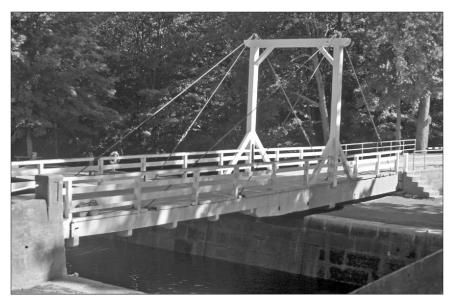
Jones' Falls Swing Bridge, a historic unequal arm, centre-bearing Rideau Canal type of timber swing bridge, reconstructed in 1960. (Photo by author, July 1974)
